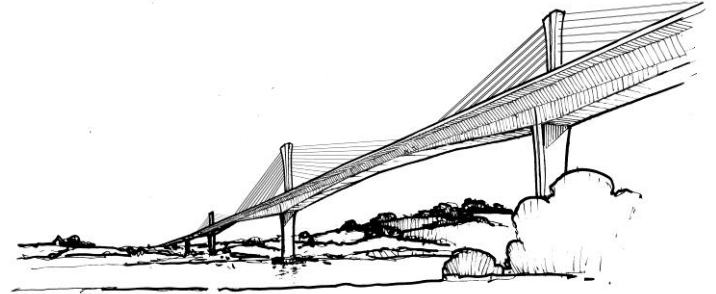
The 2005 Options Study Report recommended that the three towered extrados bridge should be developed in further detail. Yee Associates.
